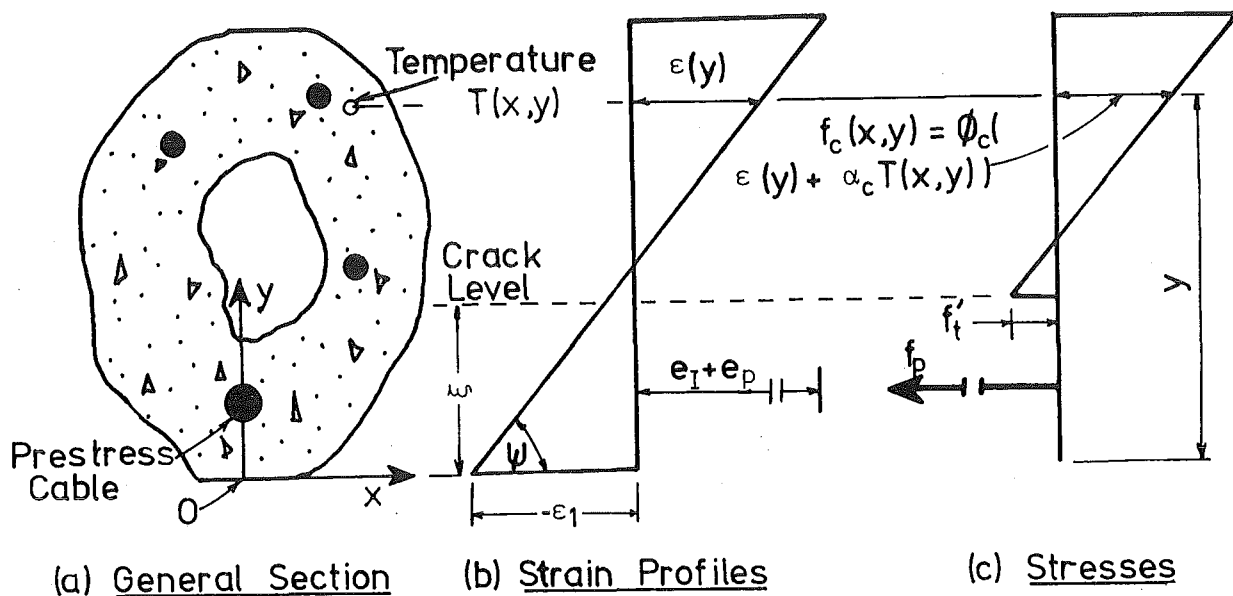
GENERAL CRACKED PRESTRESSED CONCRETE SECTION
